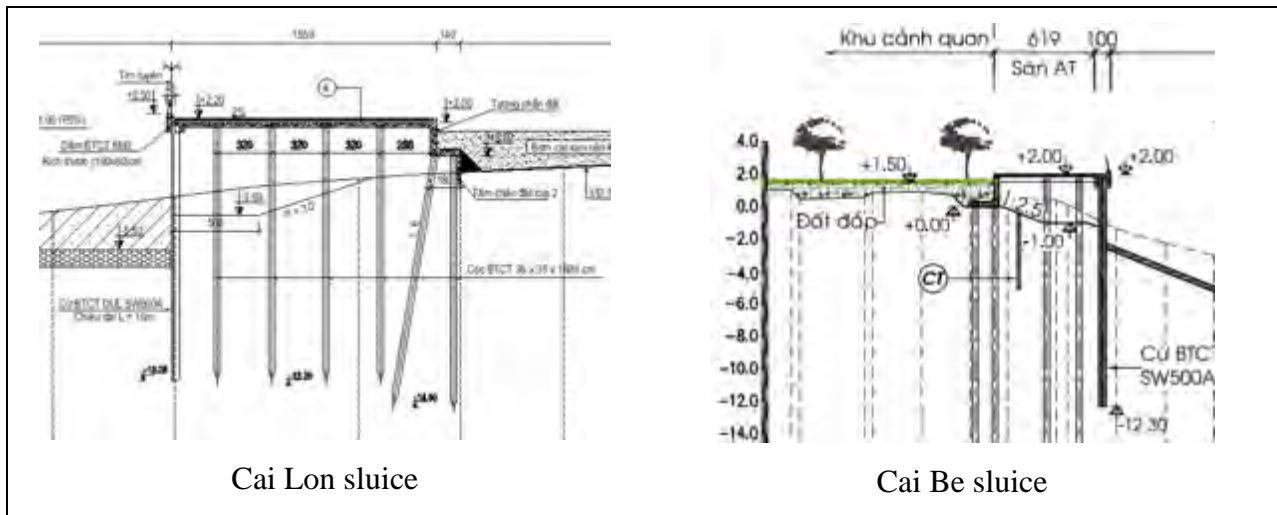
Structure of retaining walls and connected embankment for the CL-CB sluices
